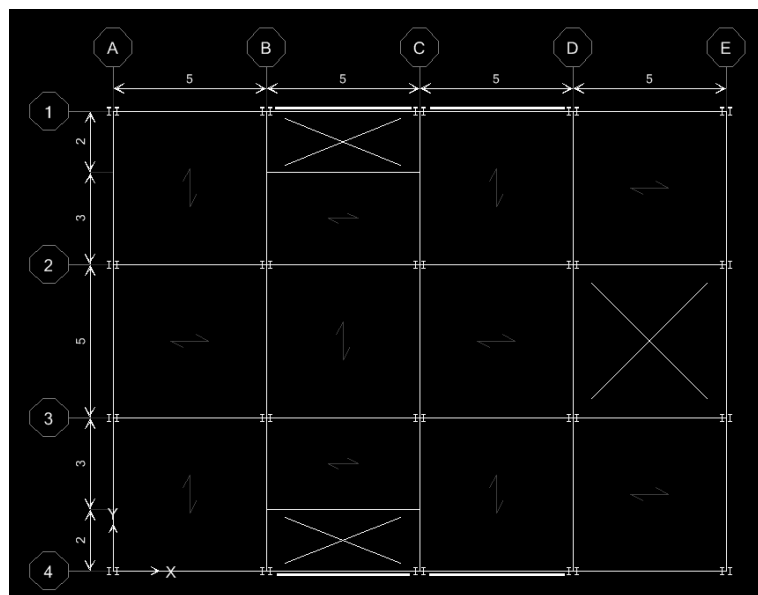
Small plan (20m x 15m) for 3, 6 and 10 story buildings and locating of braces.
